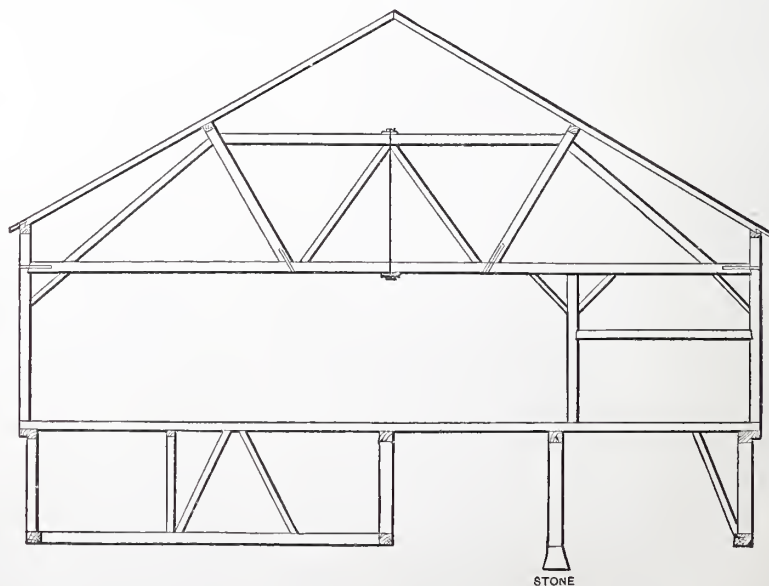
Middle Bent, Showing Plan of Truss Over Floor.
